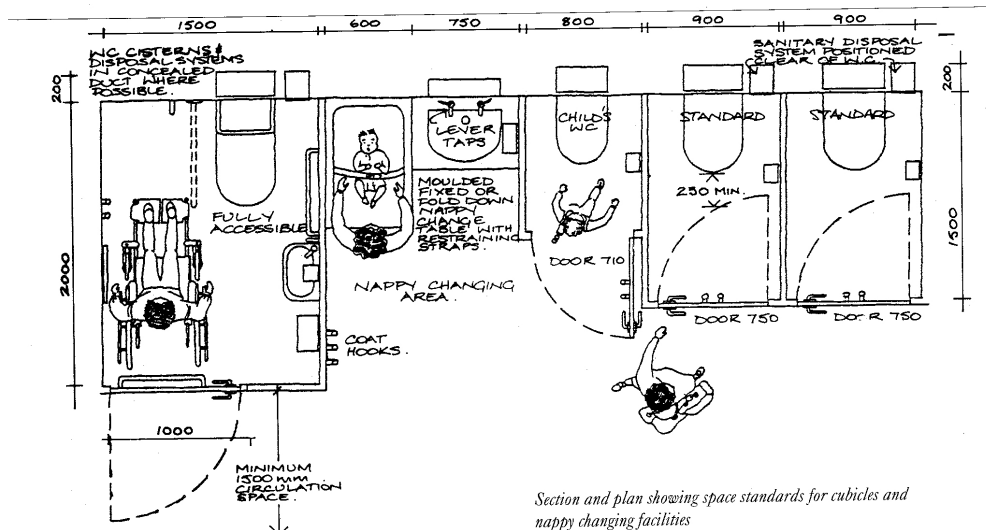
Section and plan showing space standards for cubicles. WDS,1990:58.
